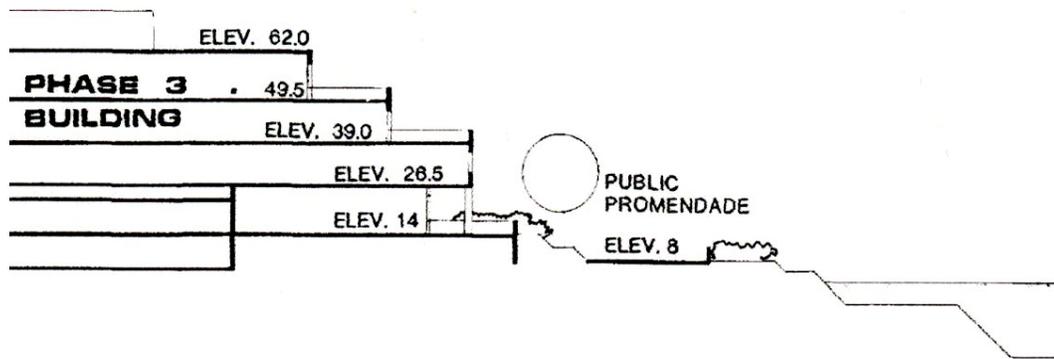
Section through Canal Center building and waterfront promenade. Courtesy of the City of Alexandria.
